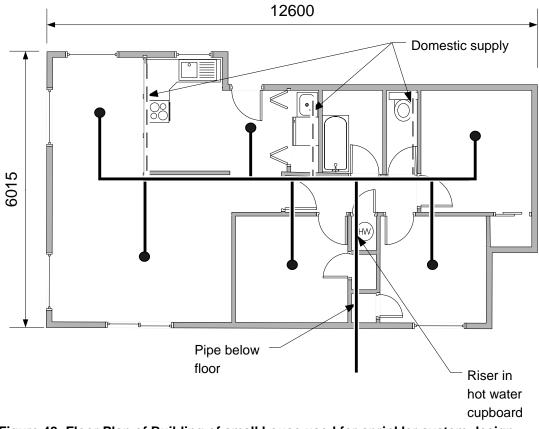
Floor Plan of Building of small house used for sprinkler system design.
